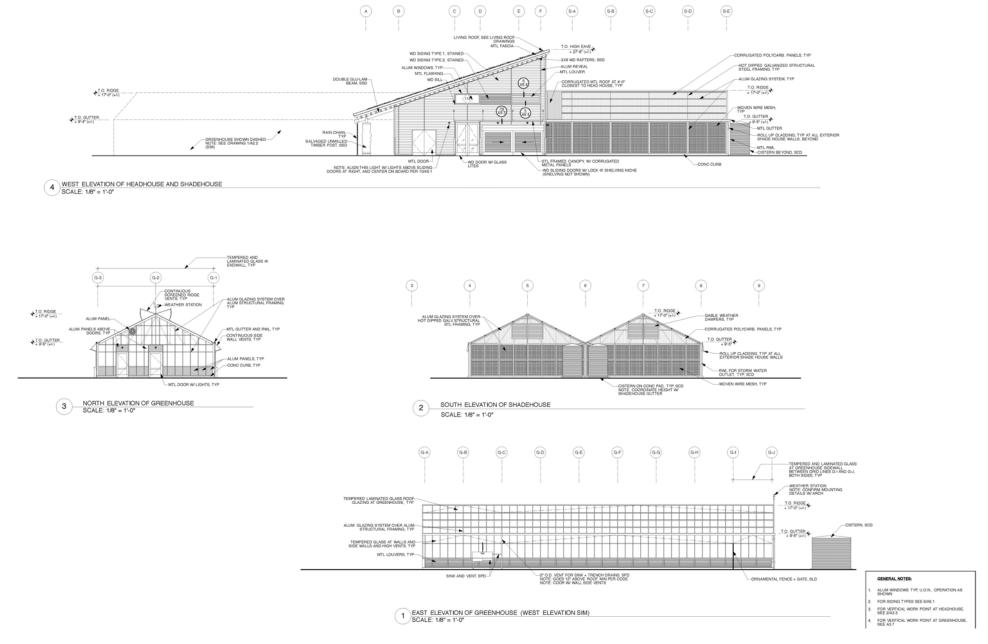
Proposed Nursery: Center for Sustainable Gardening Elevations
